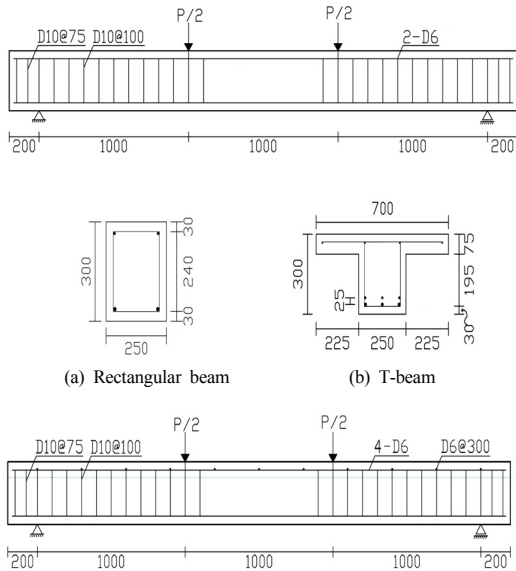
Concrete dimensions and reinforcing details for the beam specimens
